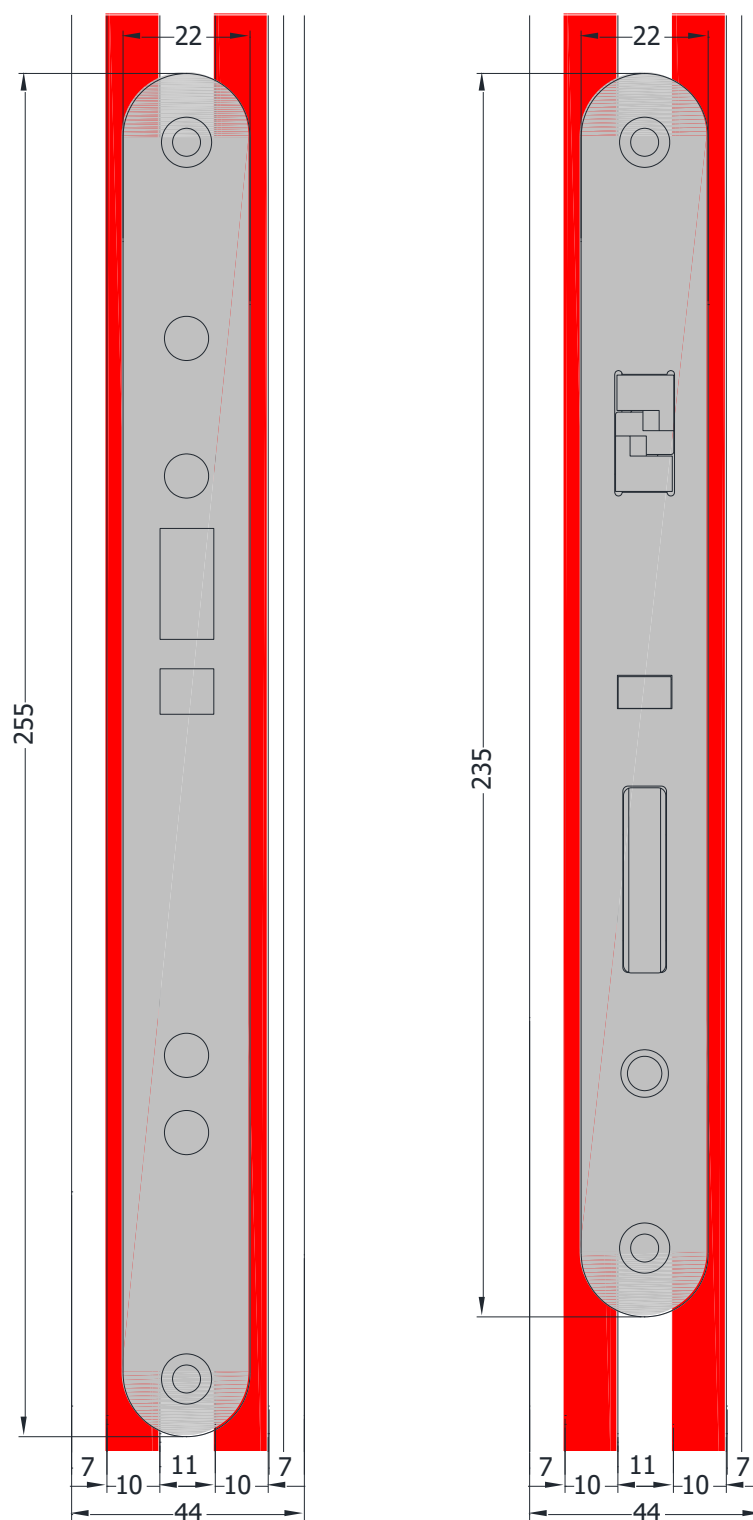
Doorset B Leaf 2 lock detail, items 15 & 16
